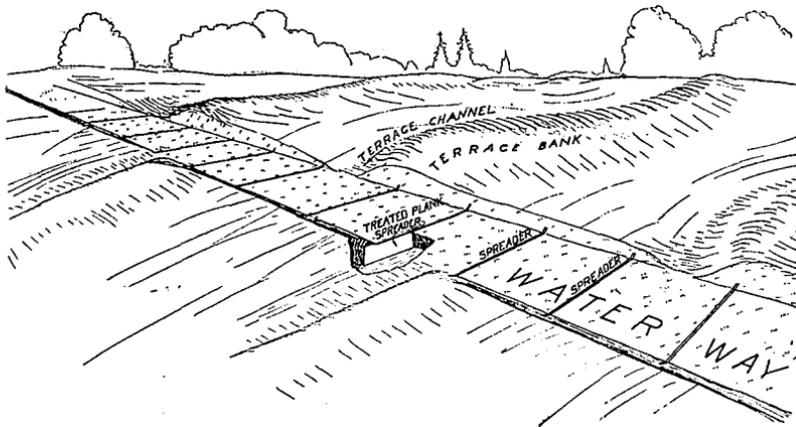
Terrace Outlet Channel Showing Treated Plank Erosion Checks
